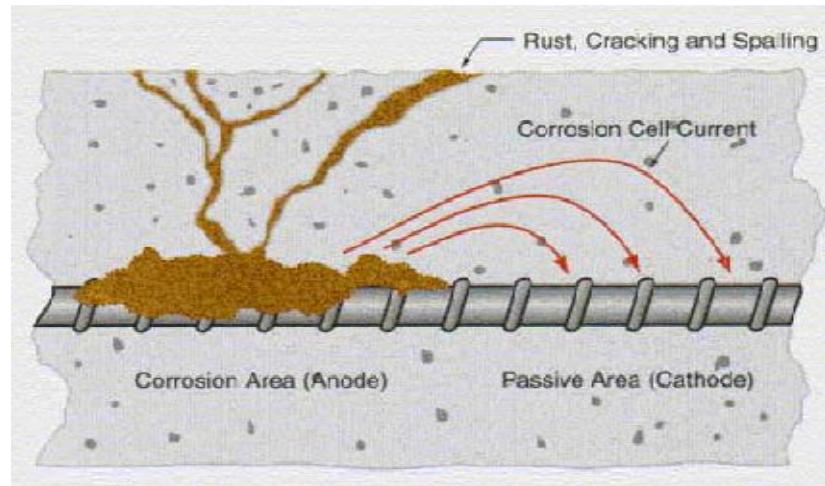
Consequences of reinforcement corrosion in concrete [9].
